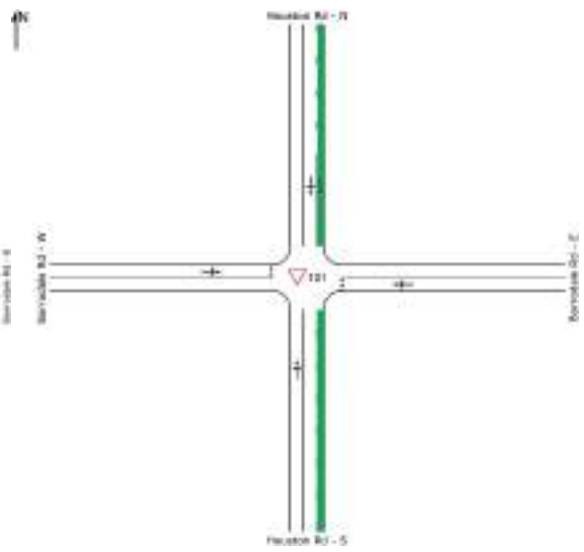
Existing Houston Road/ Gardeners Road/ General Bridges Crescent layout
